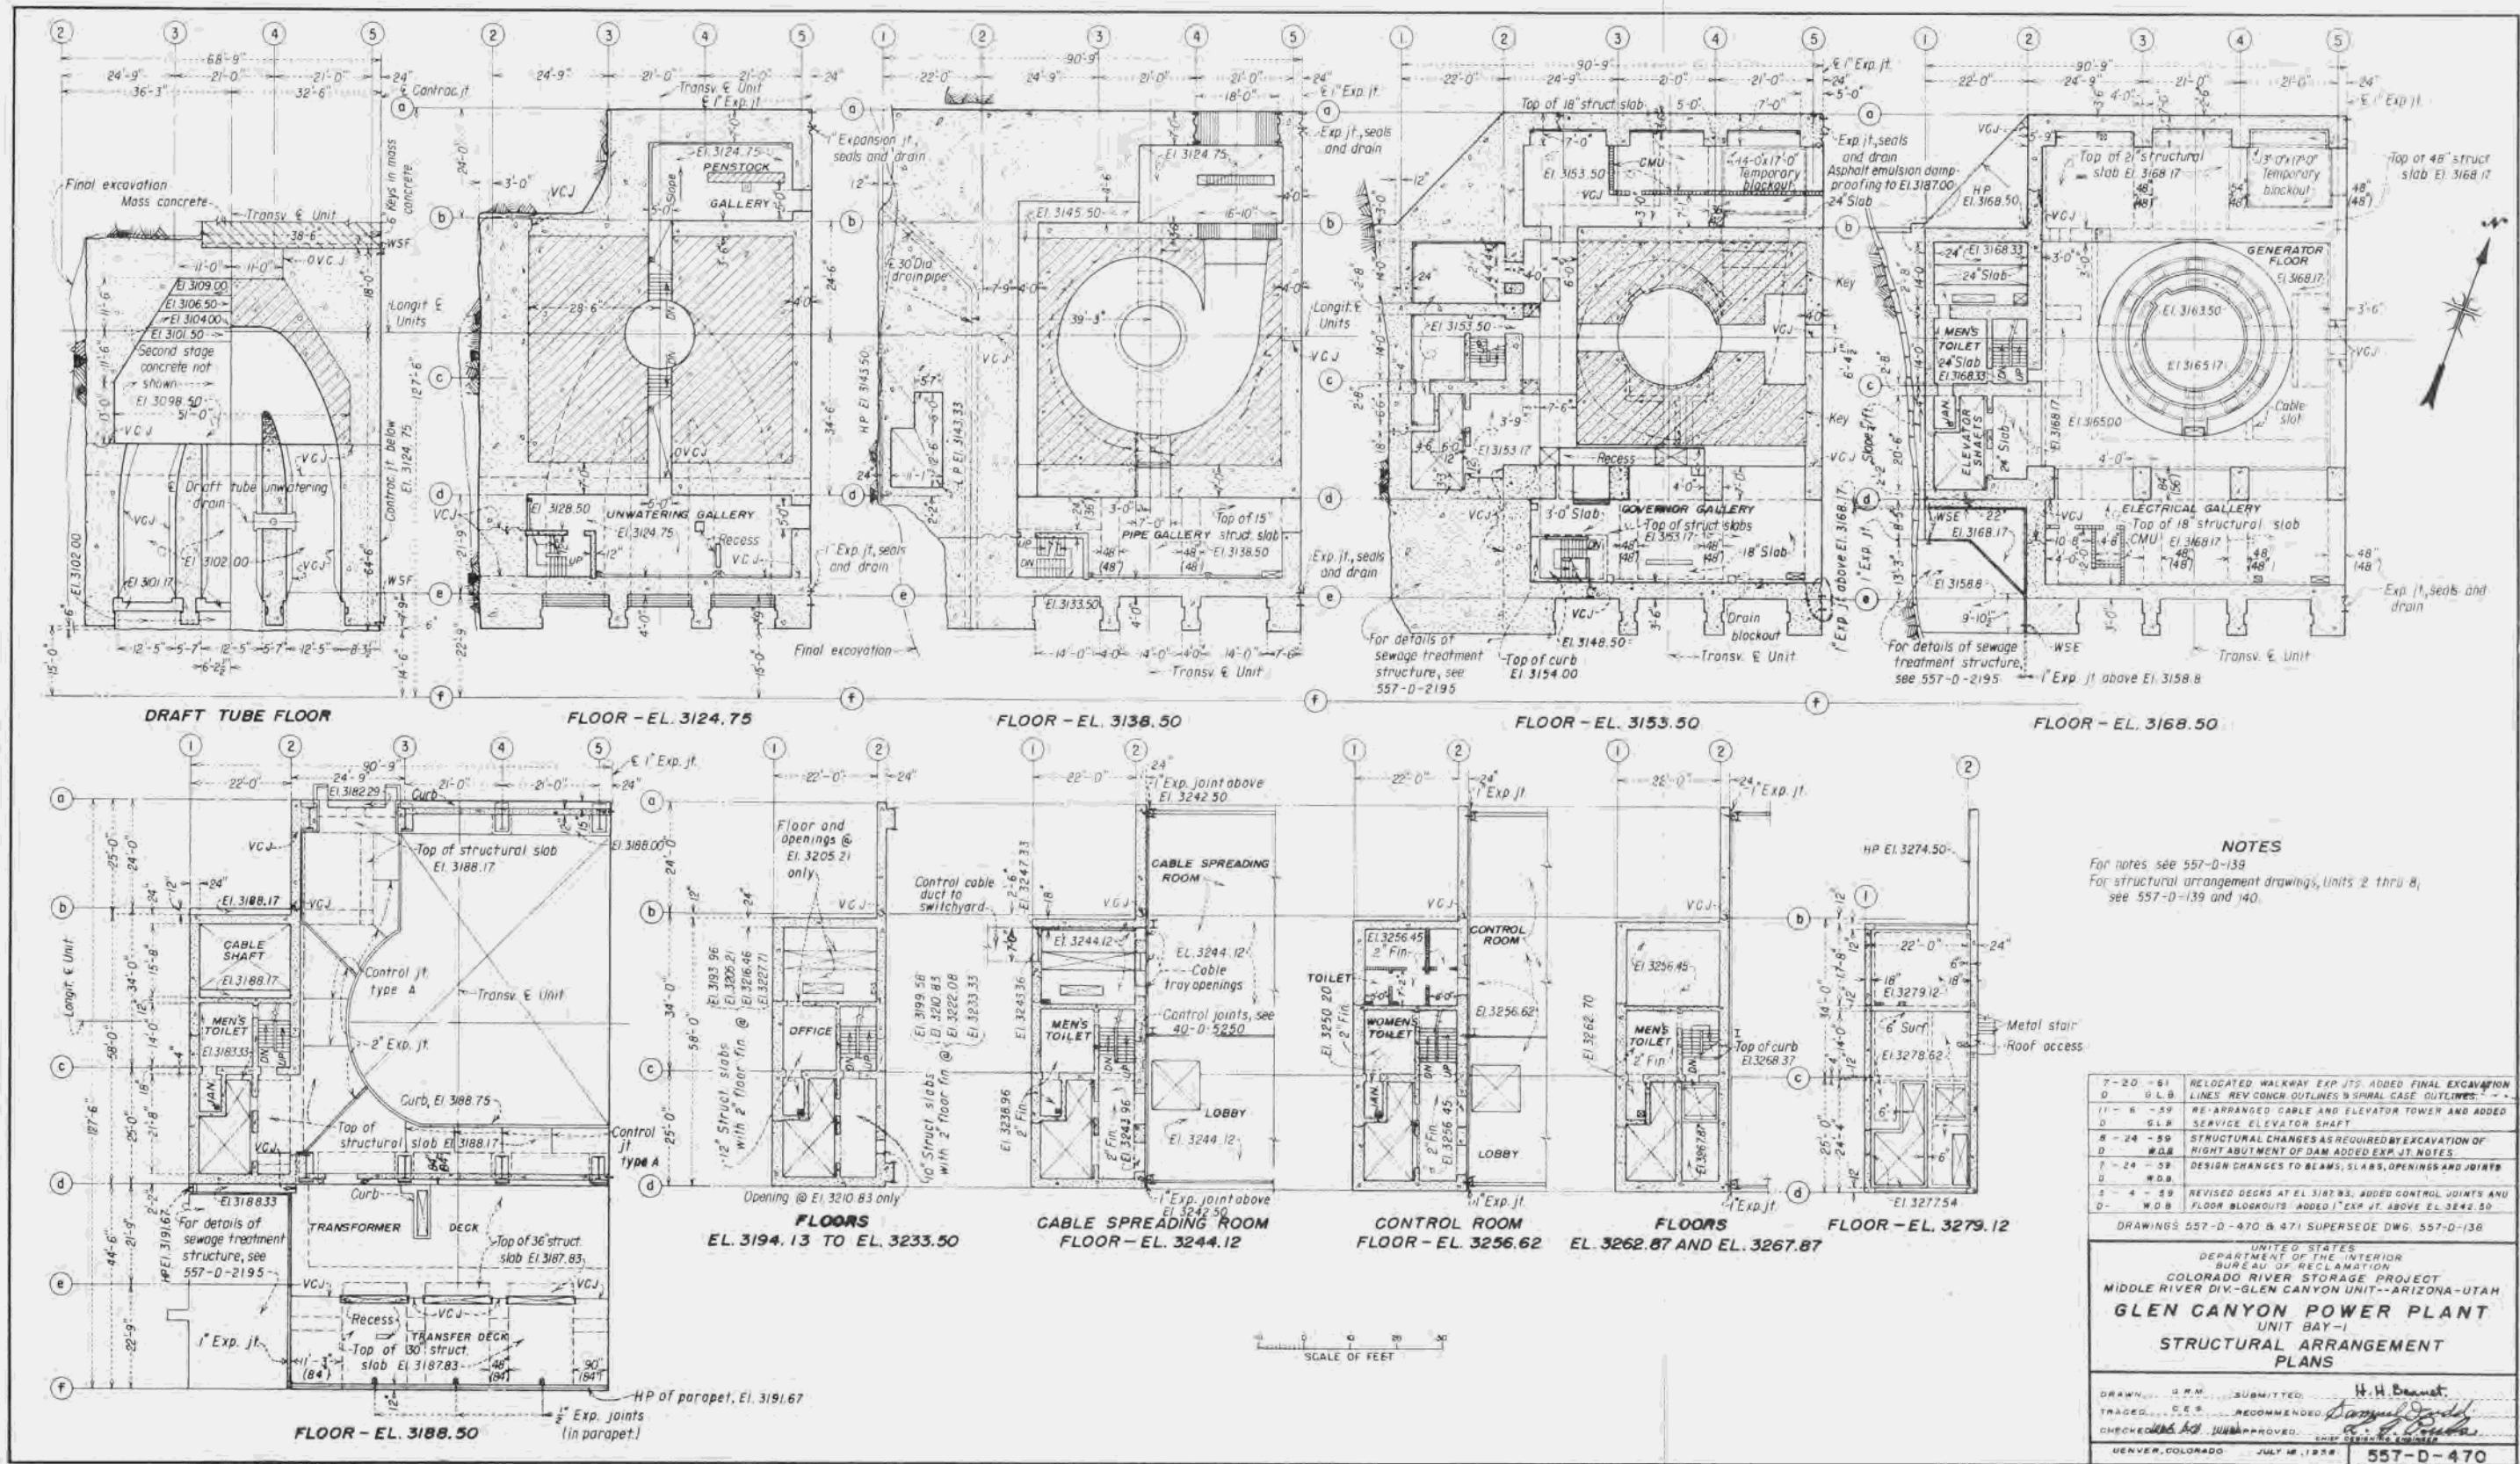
Powerplant structural arrangement plans—Unit bay 1.
